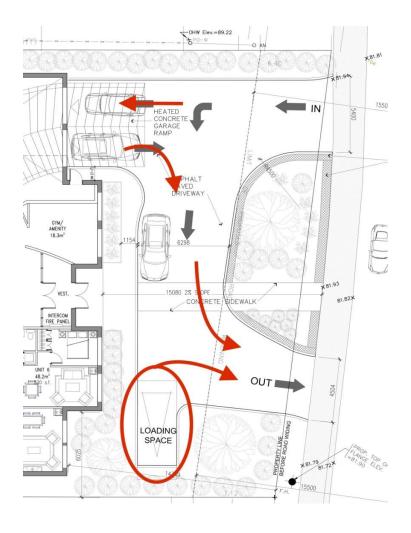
Site plan showing the loading space in front of the main entrance of the building (east elevation), as well as intended circulation through the driveway and in and out of the underground parking. Source: ARC Associates, 8 May 2019, annotated by Contentworks.
